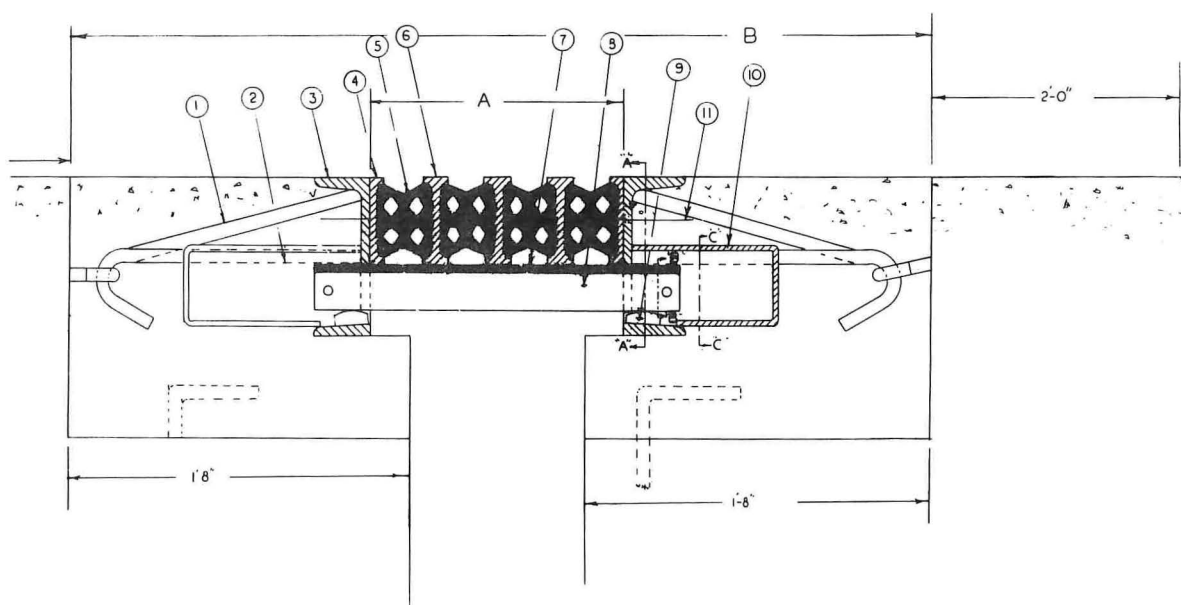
B. Plan view of 4-tube, 6-inch movement modular system.
